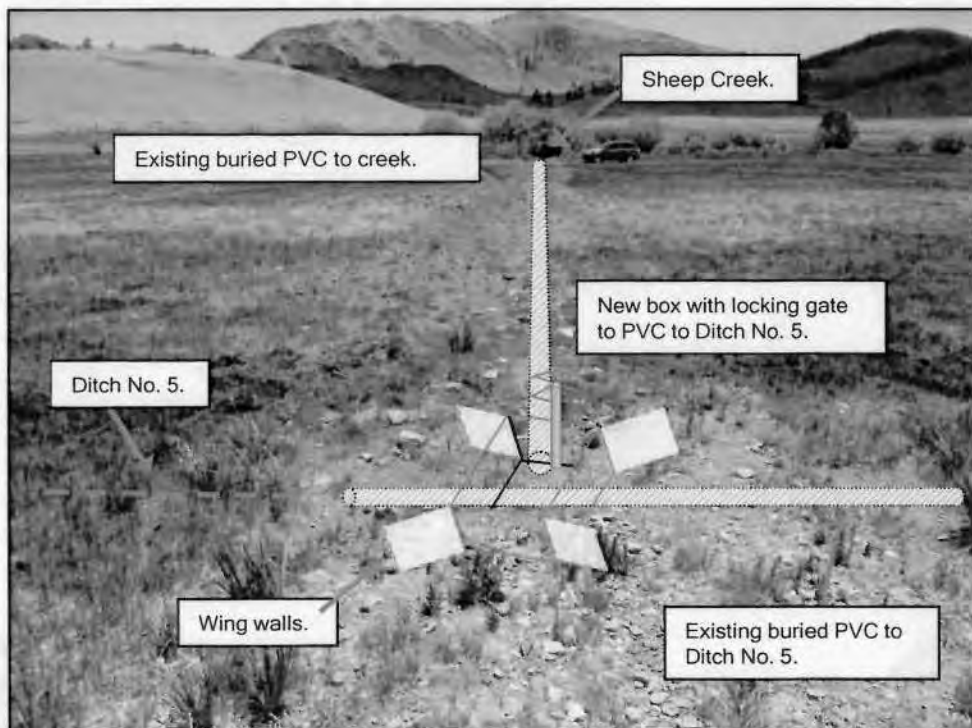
Plan for new diversion box for Ditch Lateral No. 5 (looking east towards Sheep Creek).
